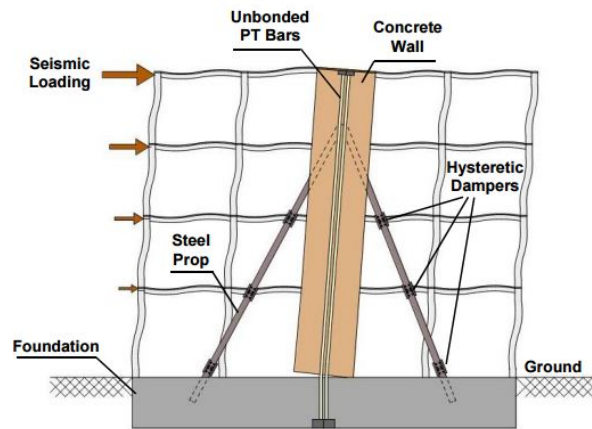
Propped rocking wall: general layout and deformed shape, [11]
